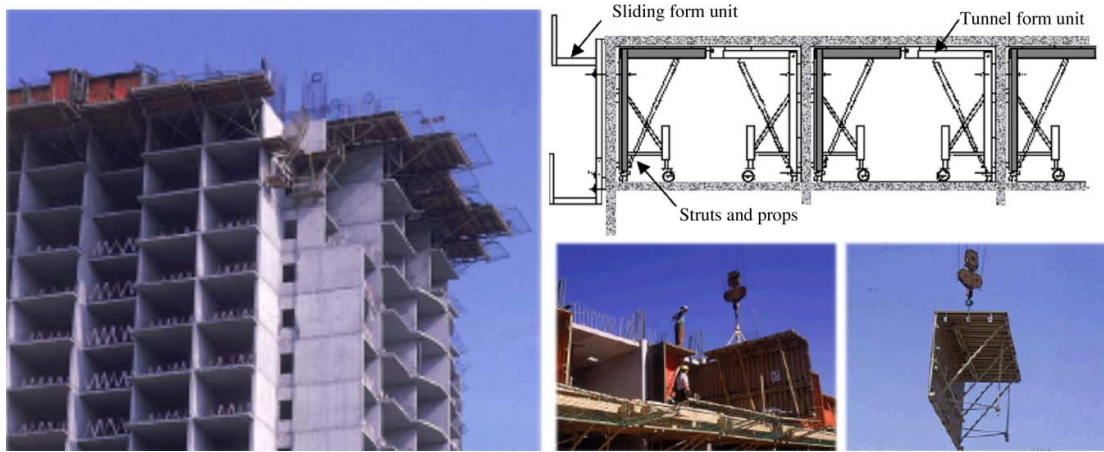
Tunnel form construction technique and its special formwork system [1]
